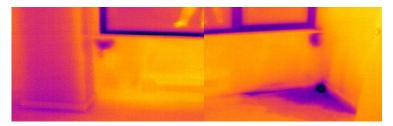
Rain water penetration into wall below corners of windows and on floor area on right side of thermal image.
